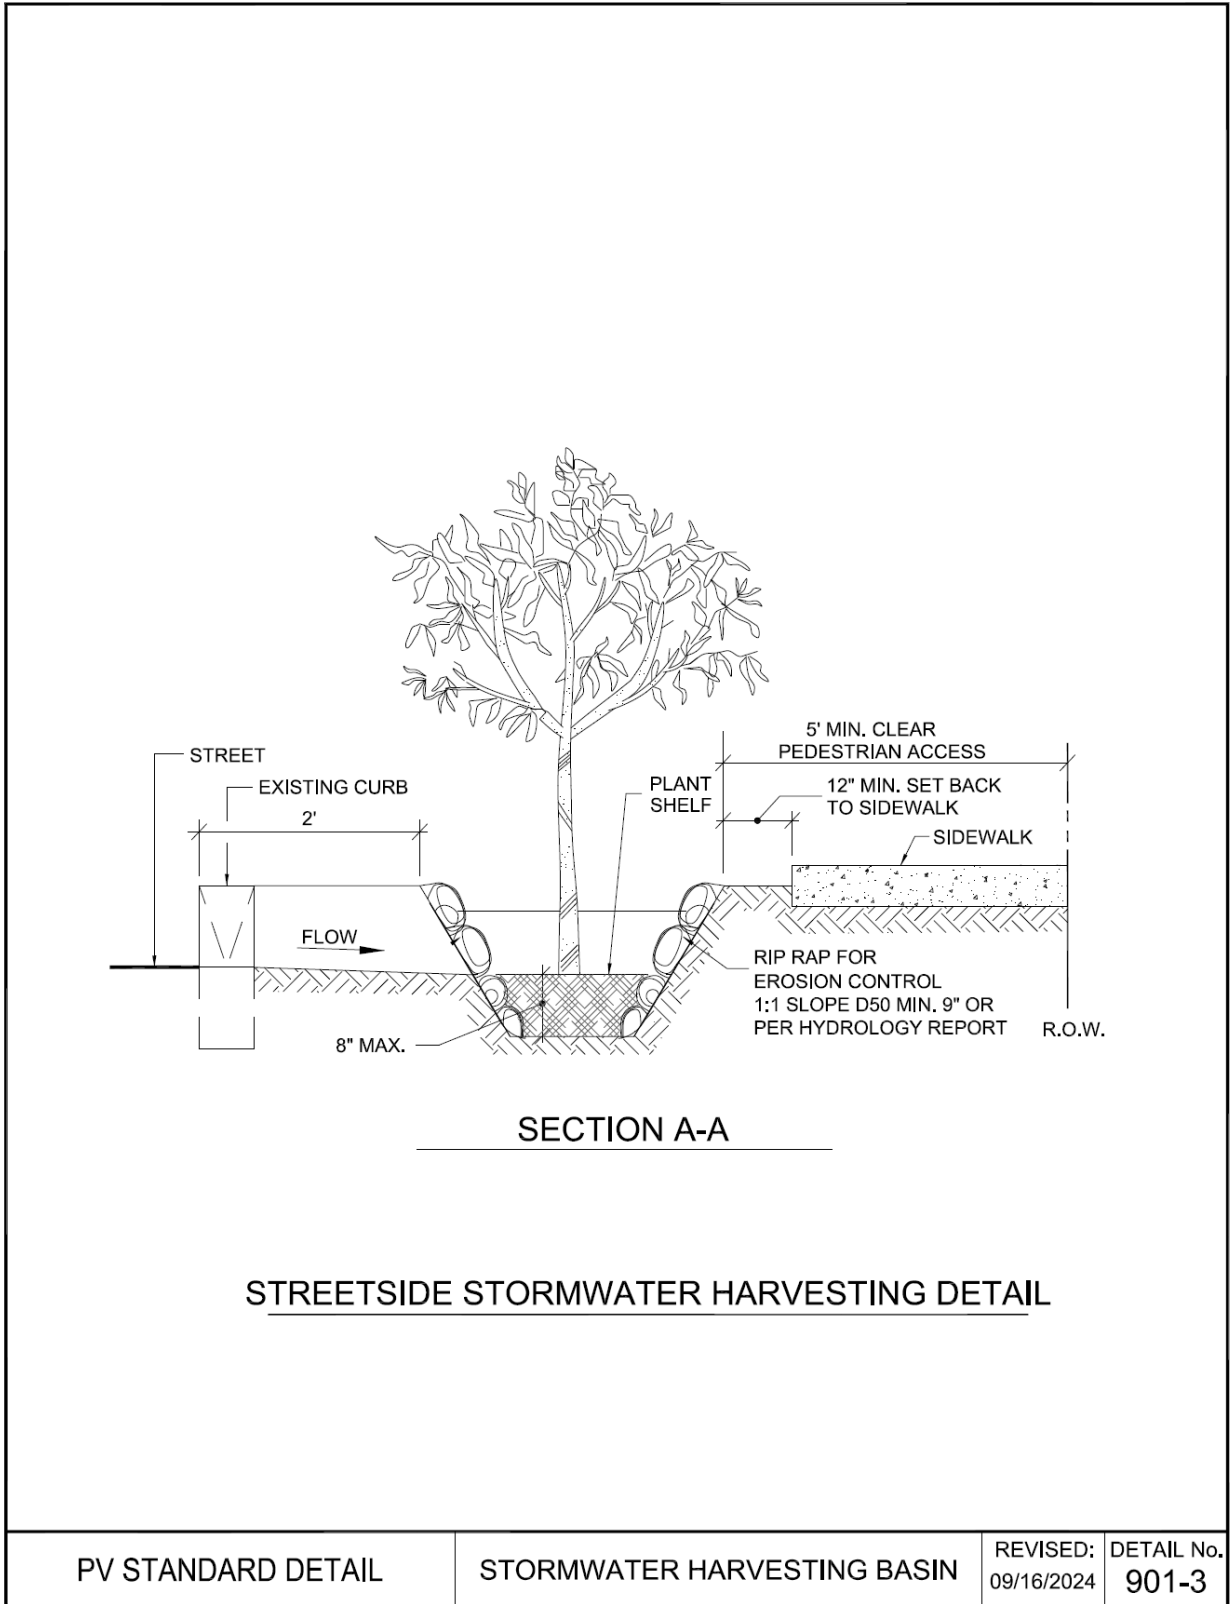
Detail No. 901-03 Stormwater Harvesting Basin
